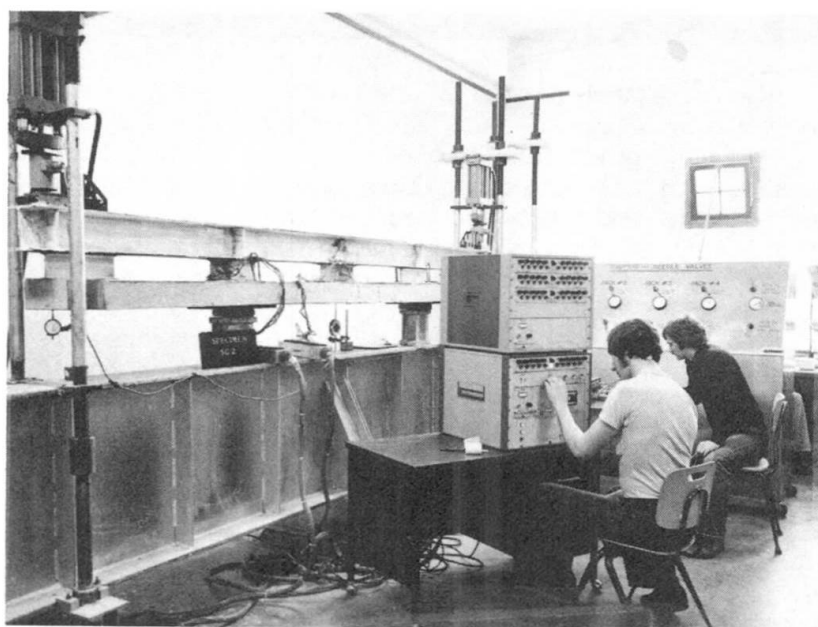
Test Set-up Used for Small Size Stub-Girders
